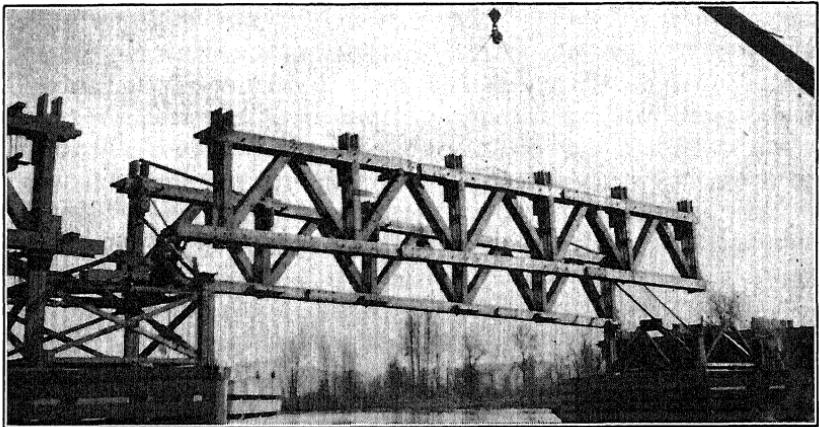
A 100-ft. truss for the Puget Island-Cathlamet, Washington, Bridge being swung into place by a large crane on a barge.
